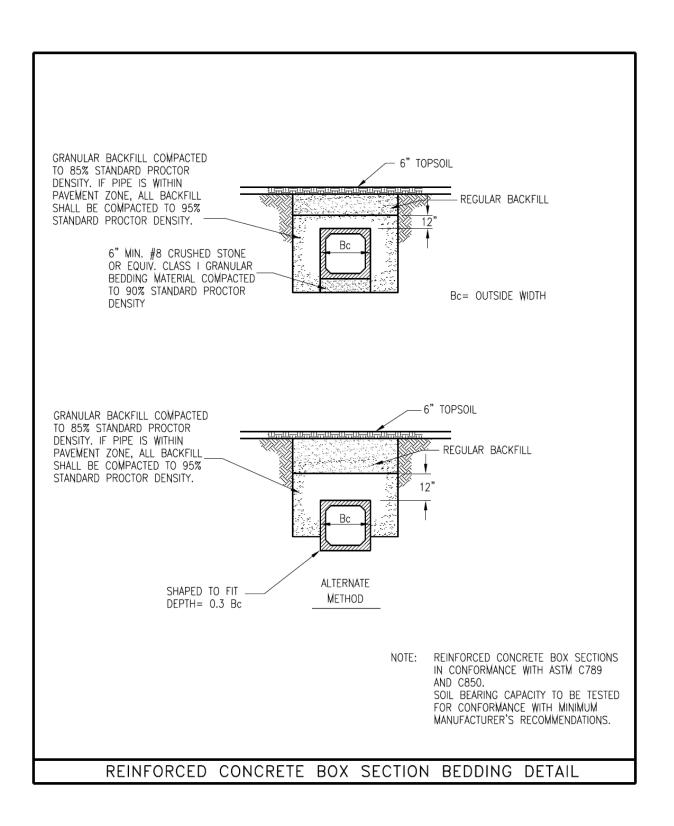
Reinforced Concrete Box Section Bedding Detail
